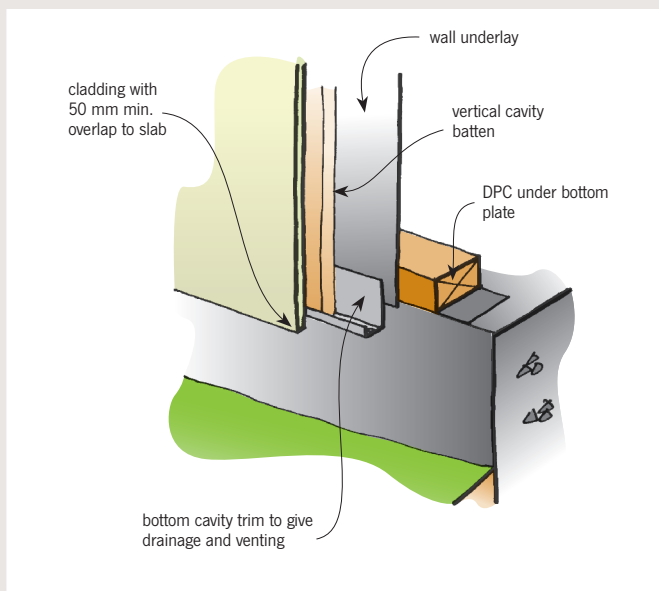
Flush-finished cladding must be fixed on a drained cavity.
